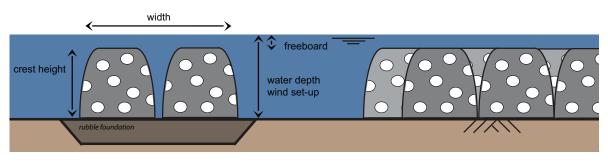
Cross-sectional View (left) and Side View (right) of Reef Ball Breakwater
